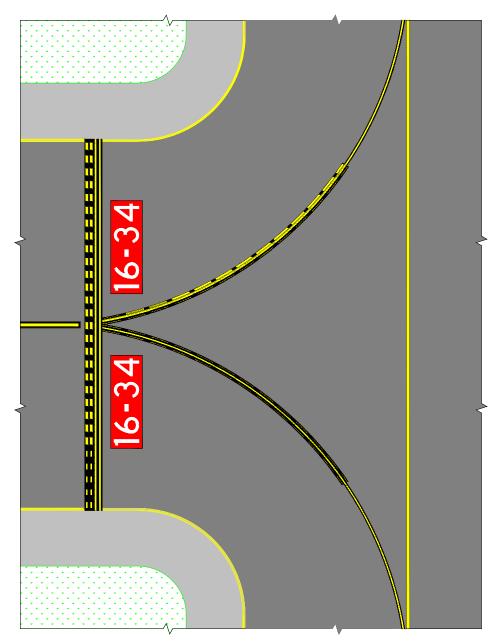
Two Taxiway Centerlines Converging at a Runway Holding Position Marking
